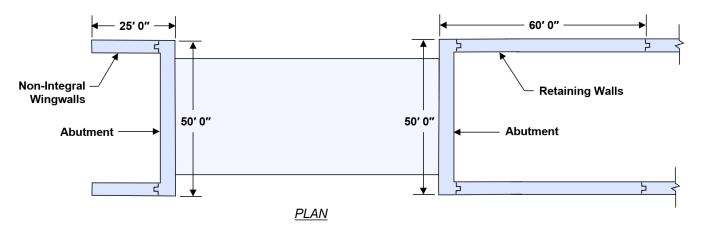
Plan View for Reinforced Concrete Abutment Example
